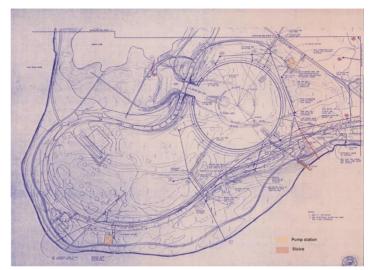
A Detailed Drainage Plan (Source: Columbus Indiana Architect Archives, 2008)
